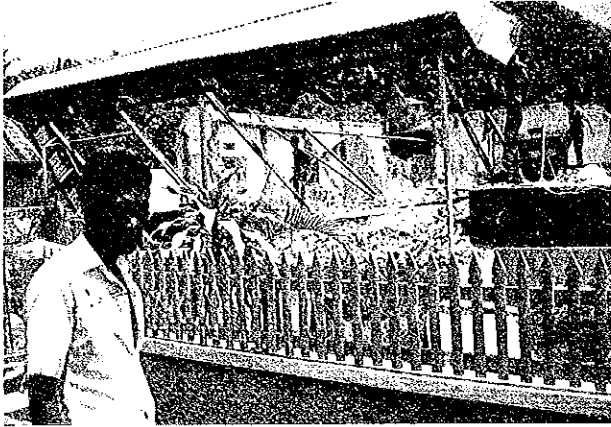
Typical Damage Pattern of Masonry Wall Building; Perfect Collapse
